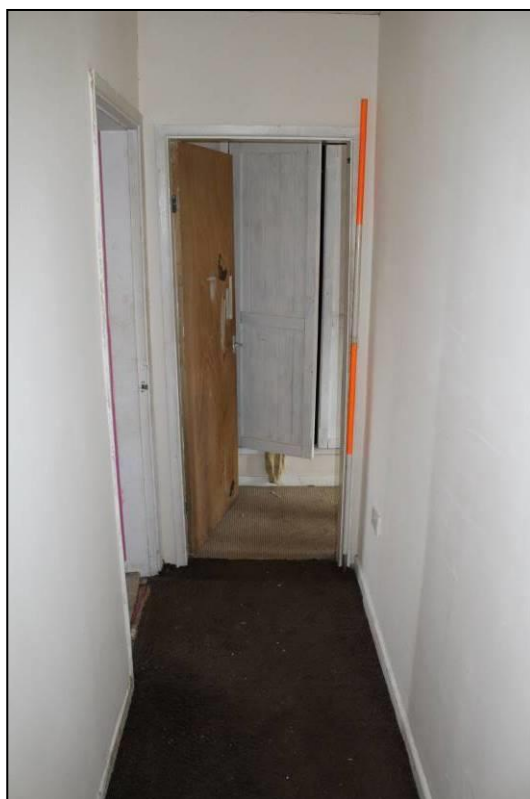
Building A: Room A2.9: view southwest, 2m scale
